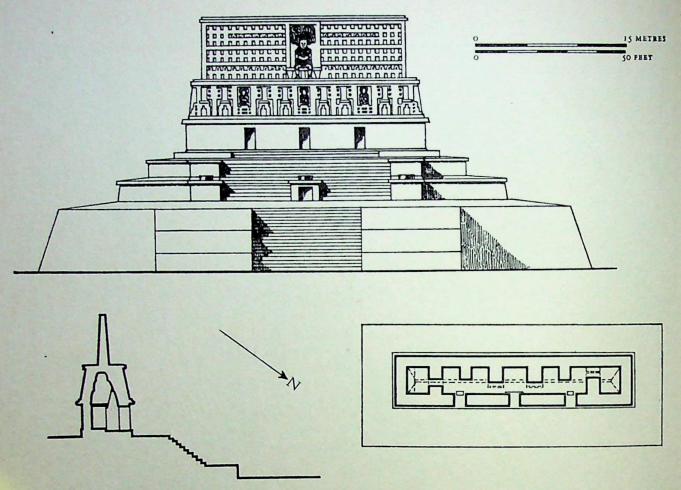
Yaxchilán, Structure 33, c. 500. Elevation, section, and plan
